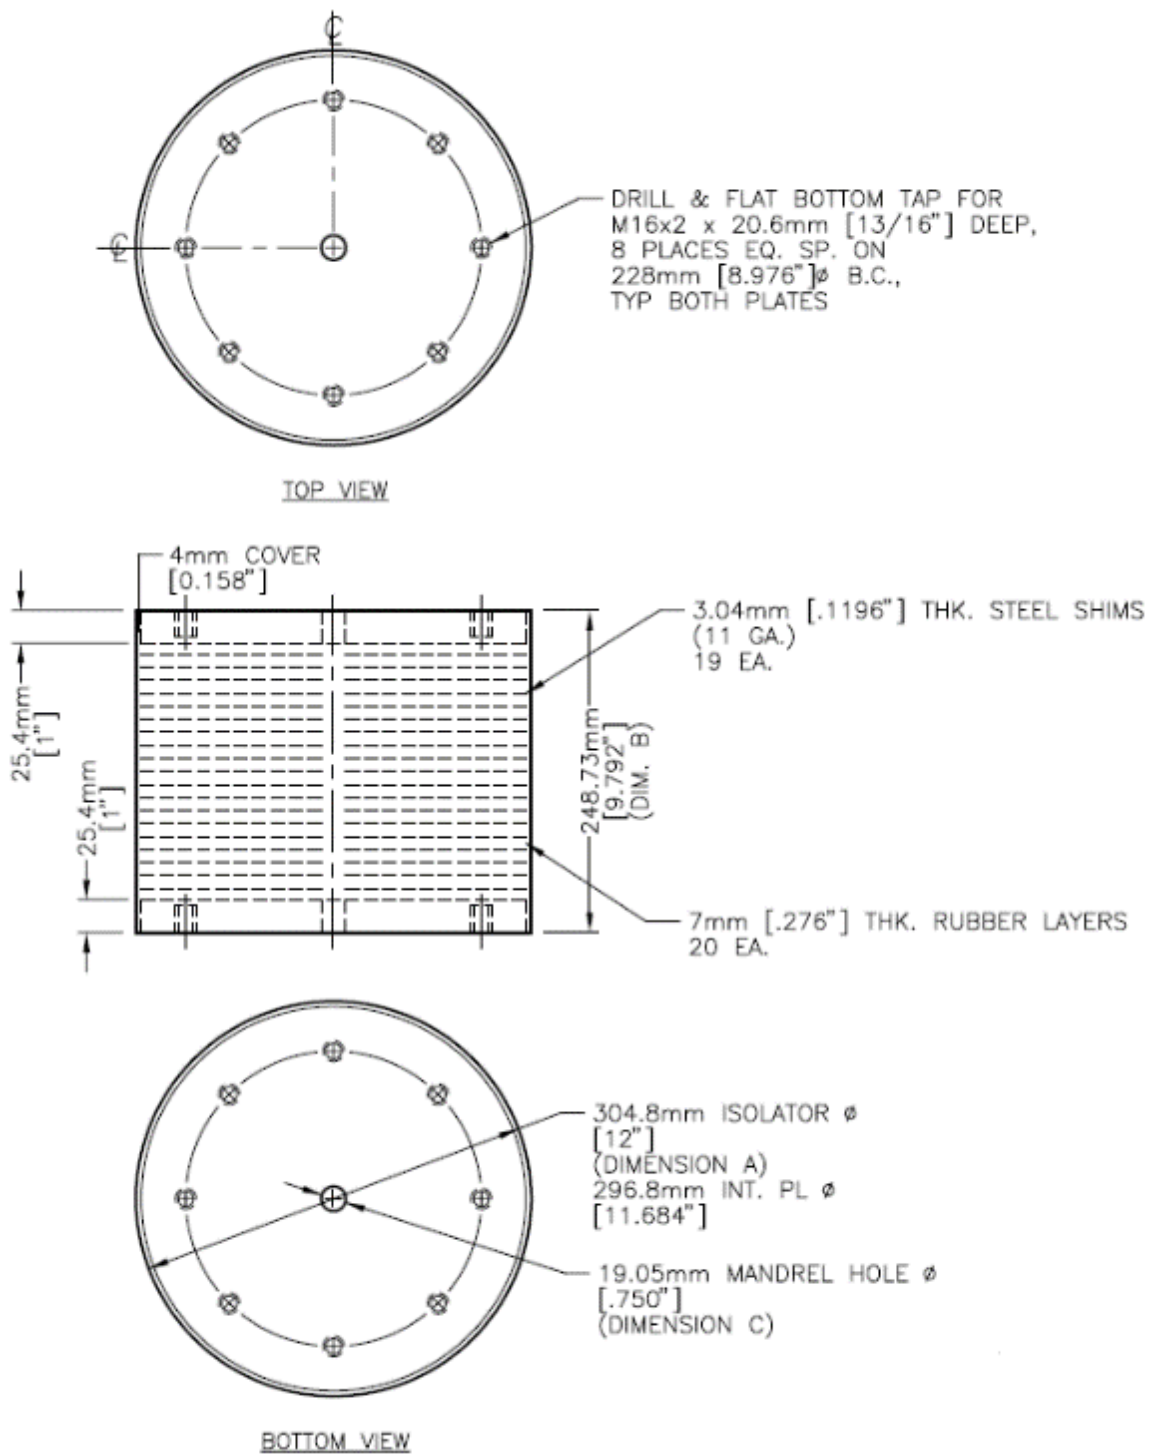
DIS bearing type A, DA (courtesy of DIS, Inc.)
